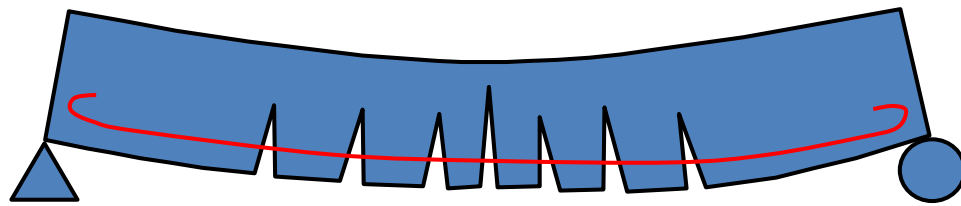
Excessive Cracks at the Bottom of Reinforced Concrete Structure
